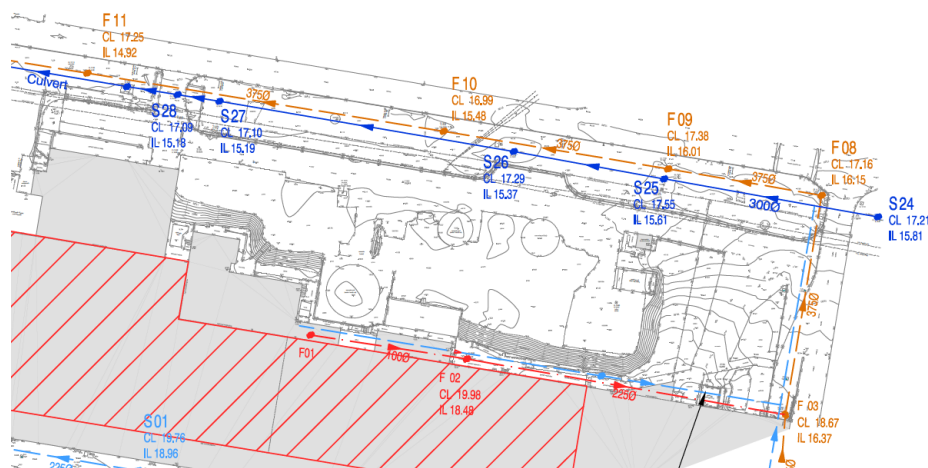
legacy Site and Drainage (Extract from Client Provided Drawing (Ref A-1) – Appendix E)
